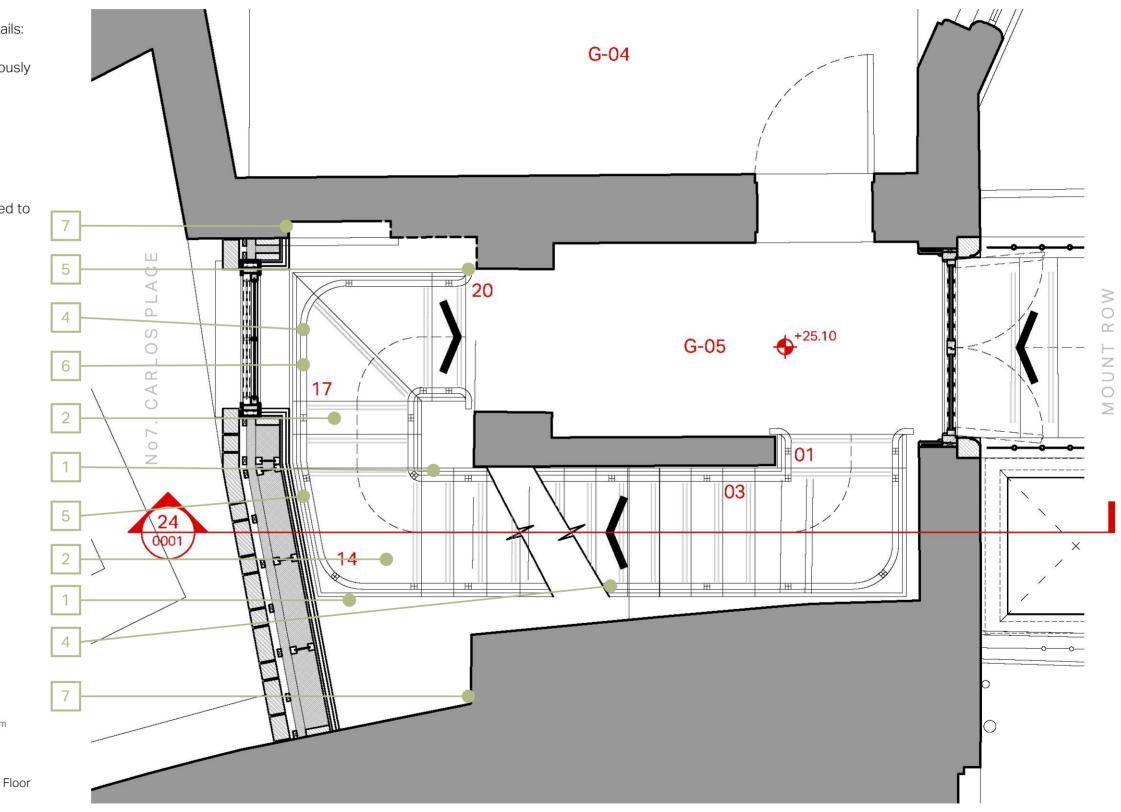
Detailed plan of the new staircase at Ground Floor level @ 1:25. Image $\ensuremath{\texttt{O}}$ Designsplus Architects
